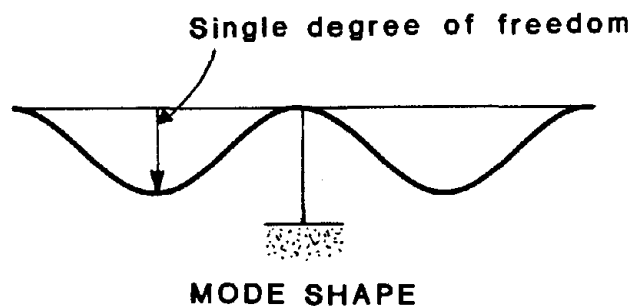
Continuous two-span bridge. Symmetric vertical flexural modes of vibration.
